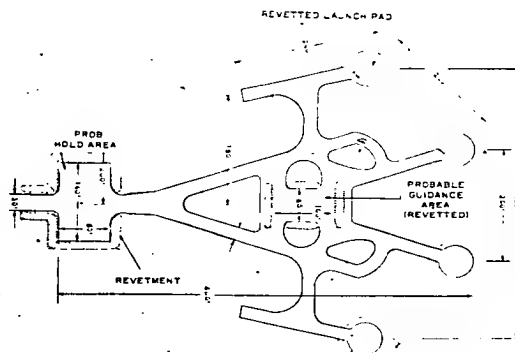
TYPICAL SA-3 SITE LAYOUT
